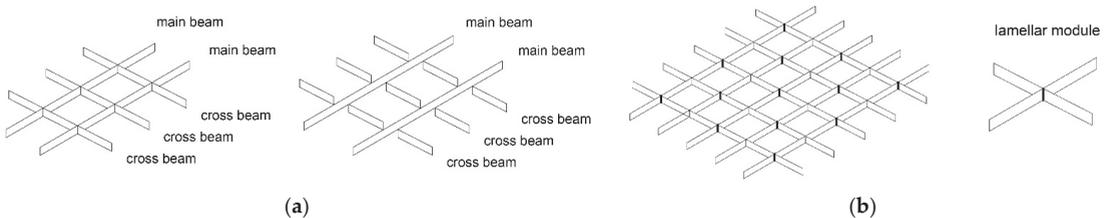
Arrangement of beams in the grillage: (a) hierarchy of beams; (b) lamellar system (figures by the author).
